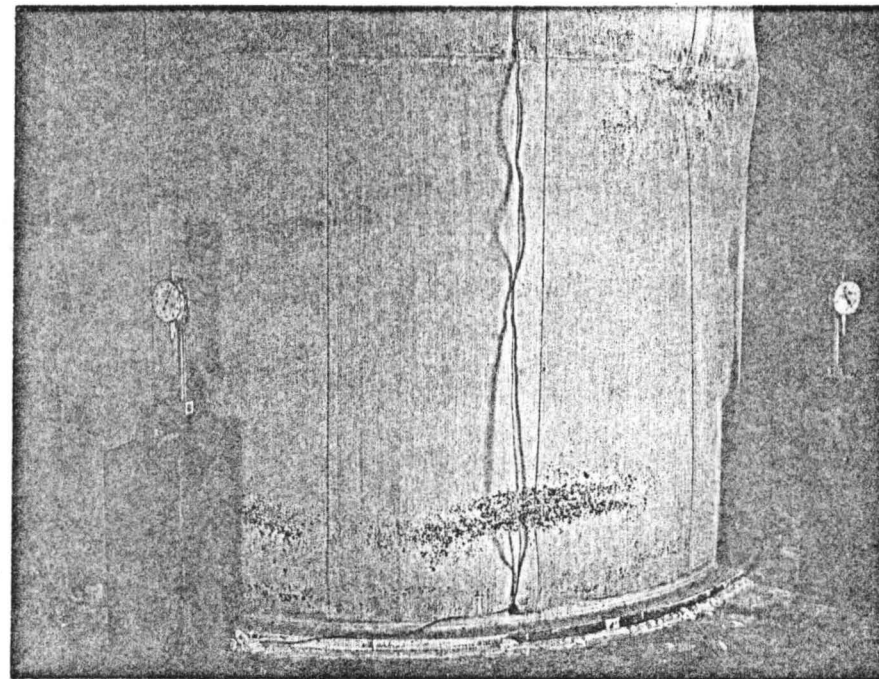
Initial Lobular Buckles at the Bottom End of Specimen P8
